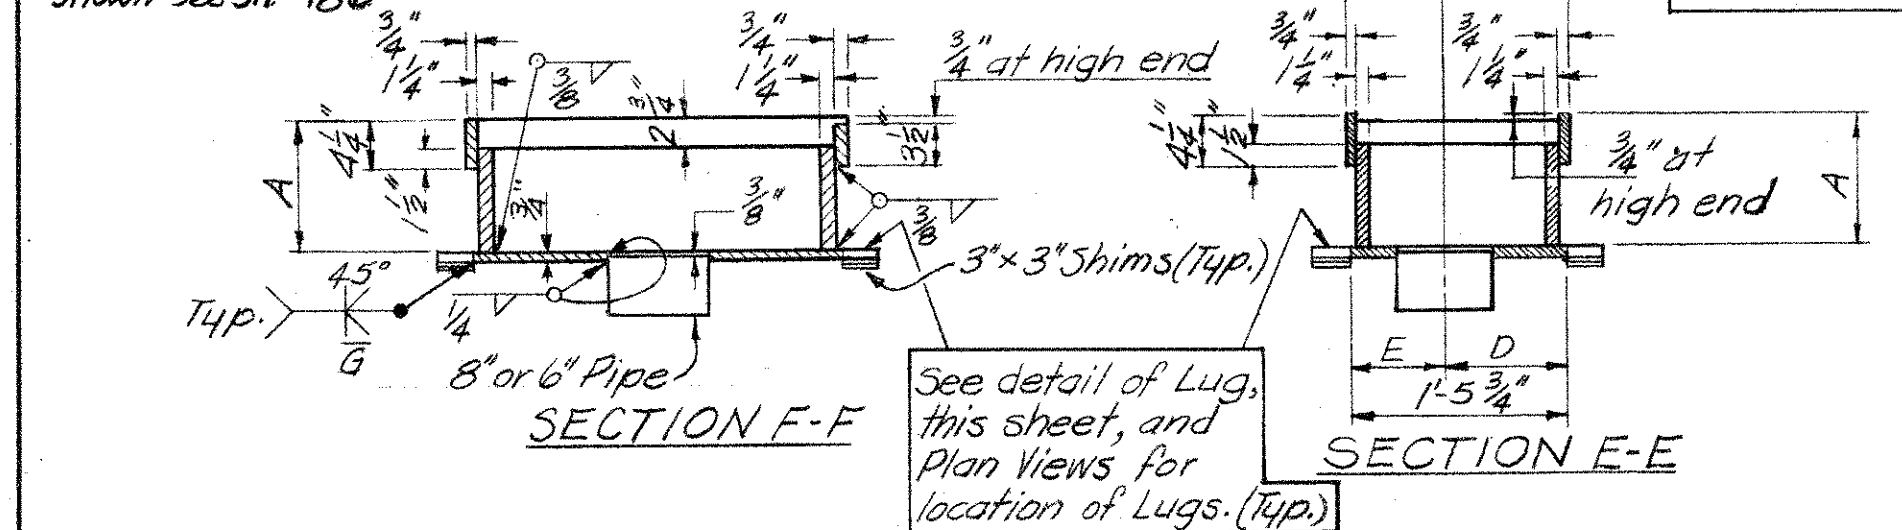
DETAIL OF DRAIN INLET AT EXISTING ABUTMENT NO.17
